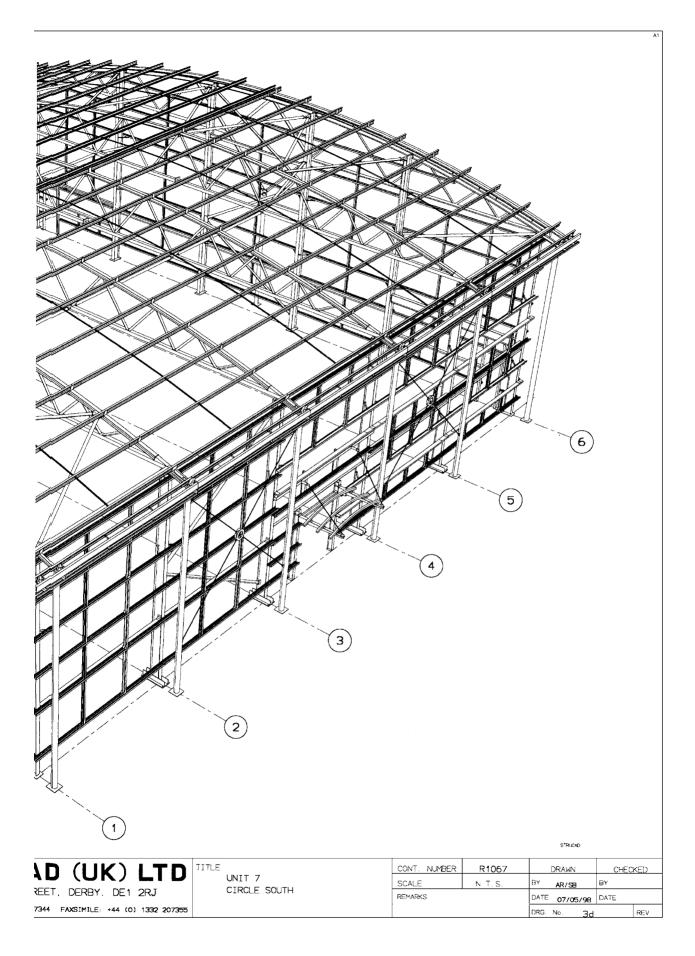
3D steel building infrastructure (Strucad, Derby, UK)
